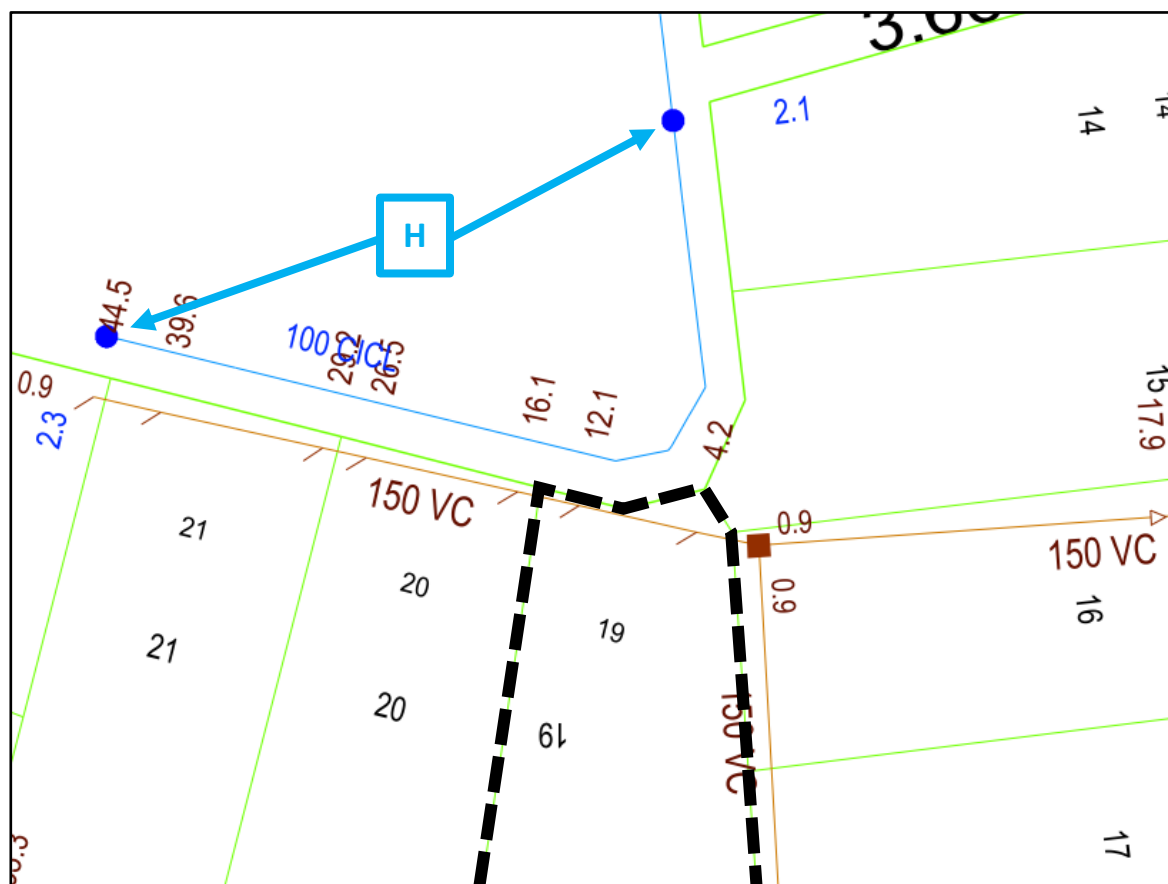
Section Sydney Water Reticulated Mains Water Supply Layout Plans
